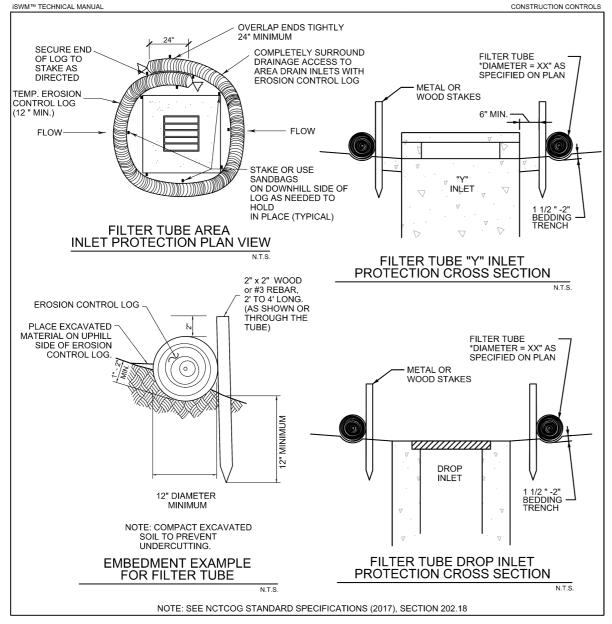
STANDARD CONSTRUCTION DETAIL - FILTER TUBE AREA INLET PROTECTION
